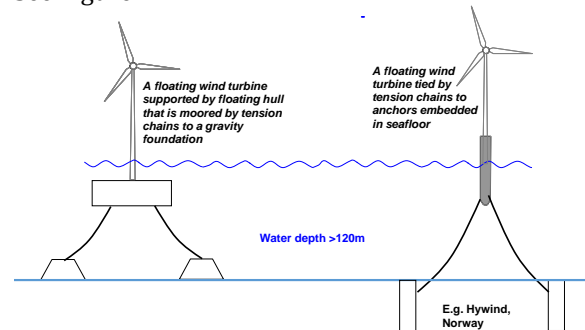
TYPES OF FLOATING ANCHOR FOUNDATIONS
